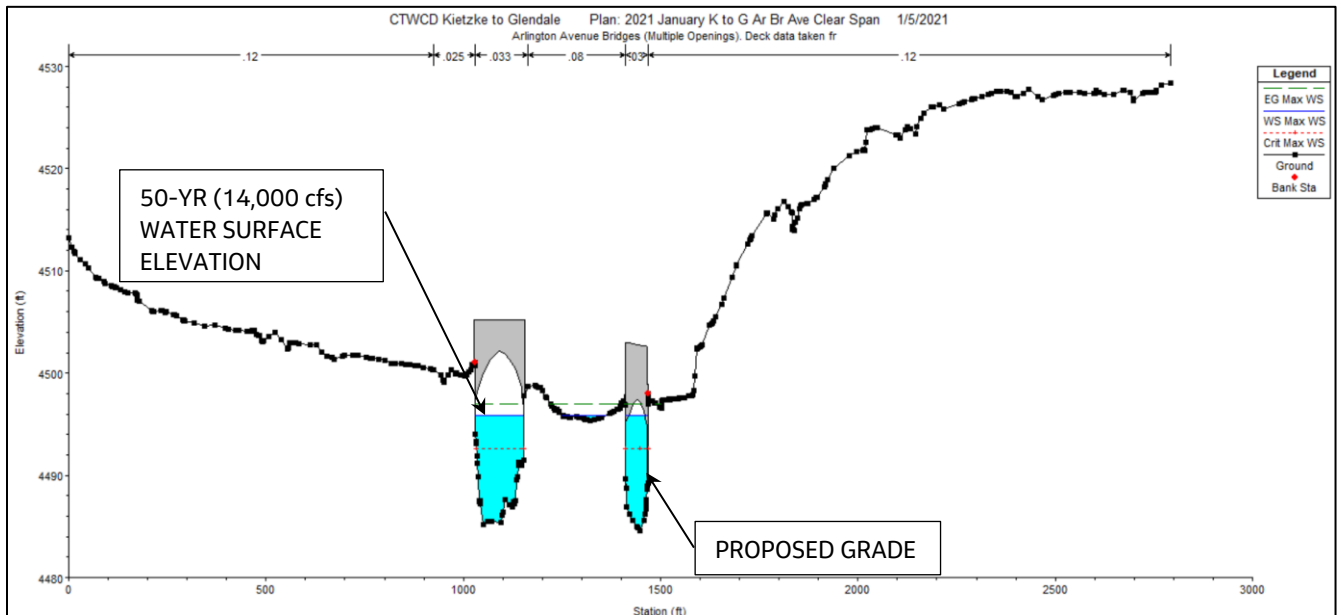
Proposed Bridges Geometry and Freeboard for Alternative 1
